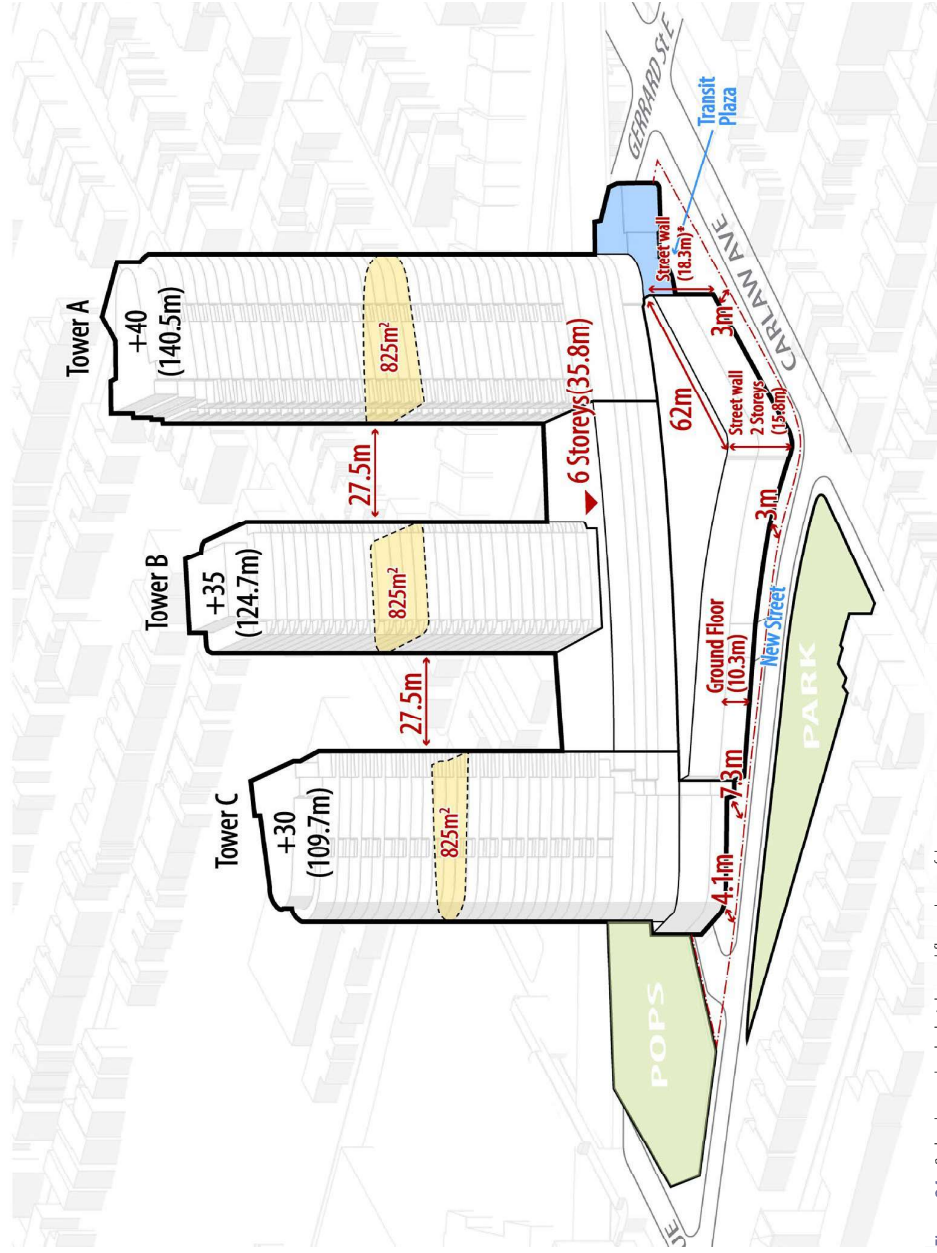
Setbacks, setbacks, heights and floor plates of the tower
